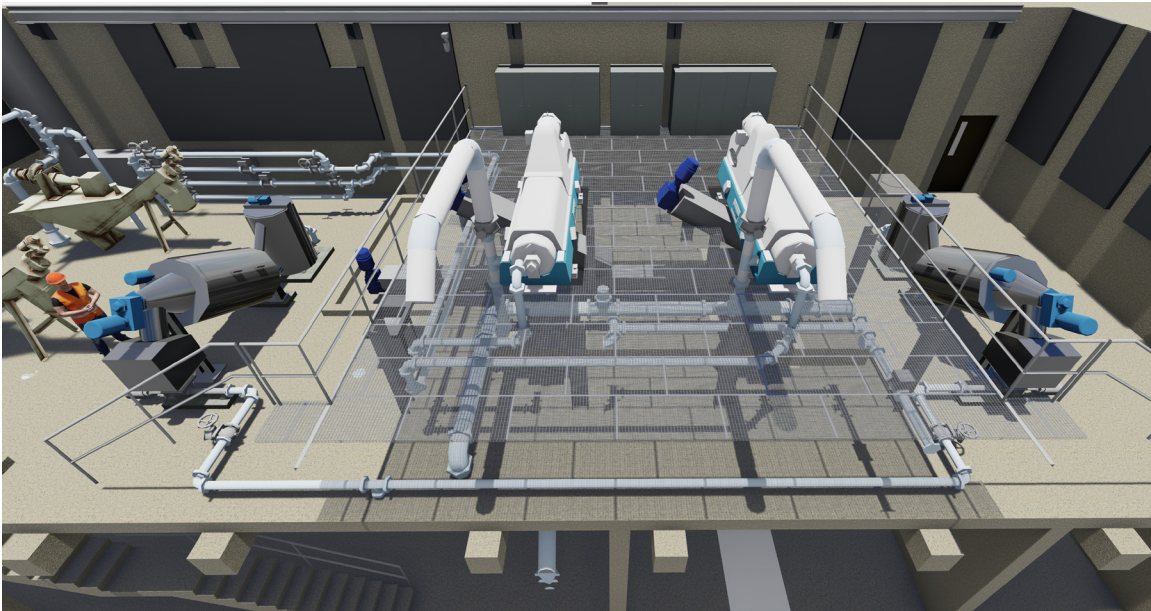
3-D Model of Installing the New Thickening Technology at the Existing Dewatering Building.
